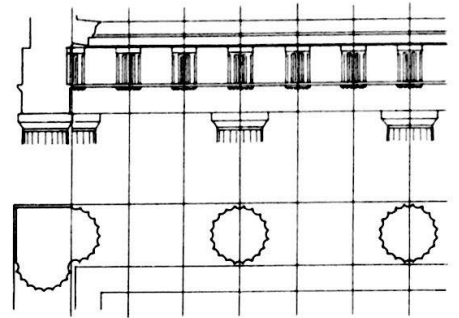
Heart-shaped corner support in the Doric order; elevation and plan.
